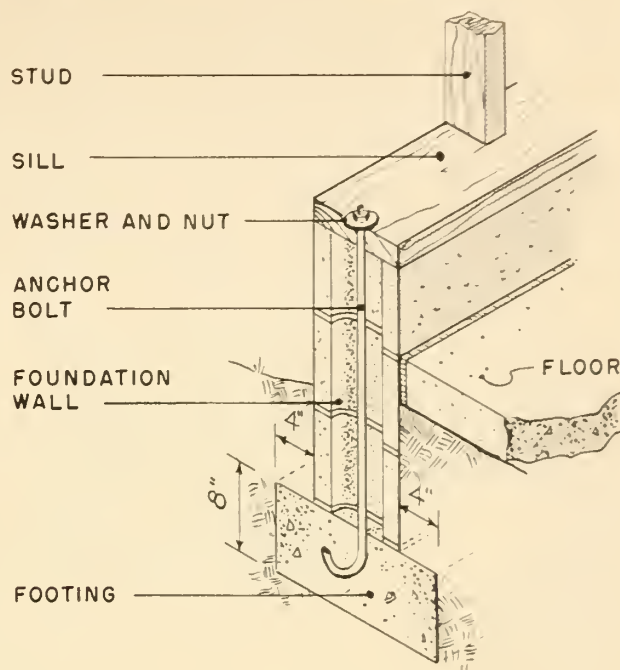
Detail of foundation and footing. Note that anchor bolt extends into footing.
